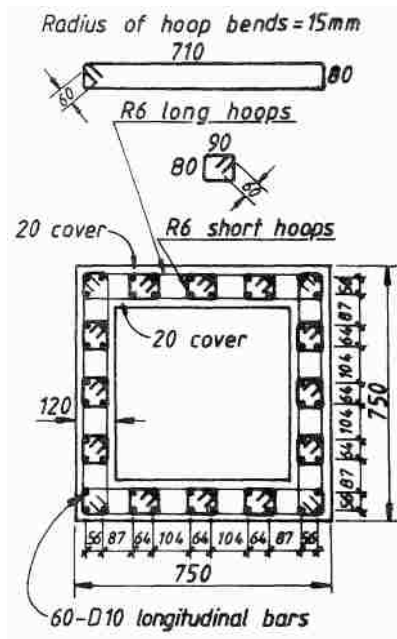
Cross-section of the hollow-core concrete column with two layers of reinforcement (Mander et al. 1983)
